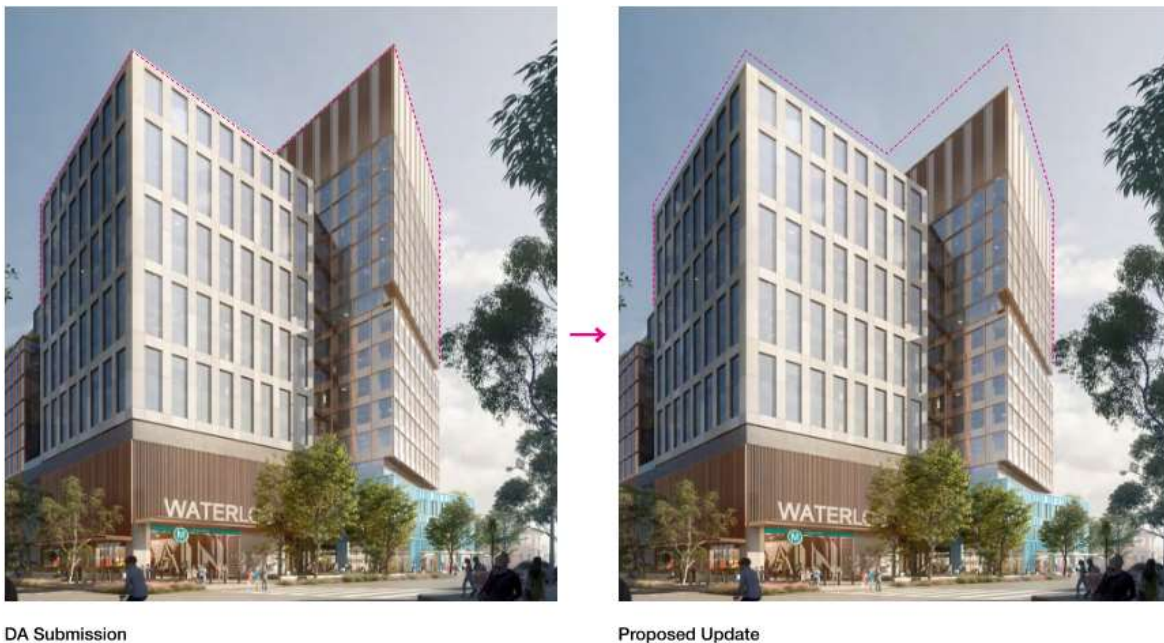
Photomontage of view from Cope Street looking north-west, indicating extent of proposed reduction of building height of Building 1 (right) from the as-submitted design (at left)
